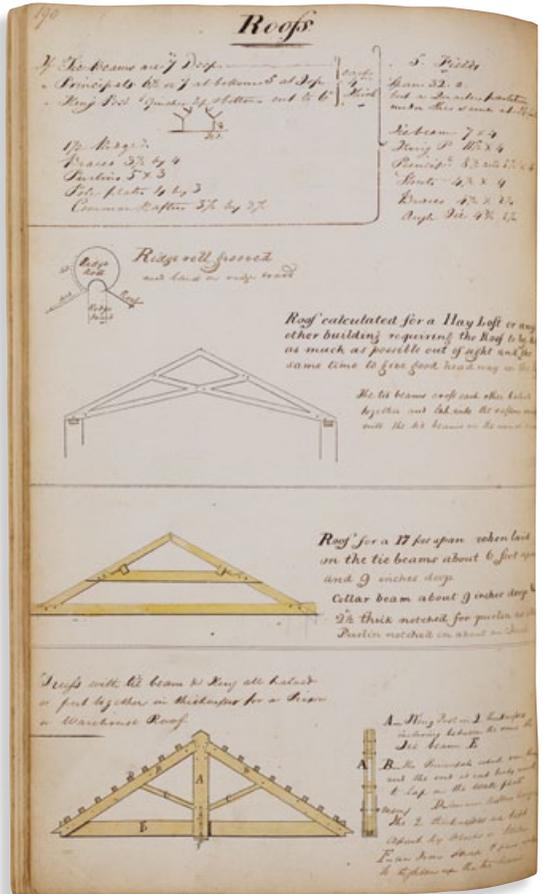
Roof Trusses, sheet 190A. (Avery Classics)
